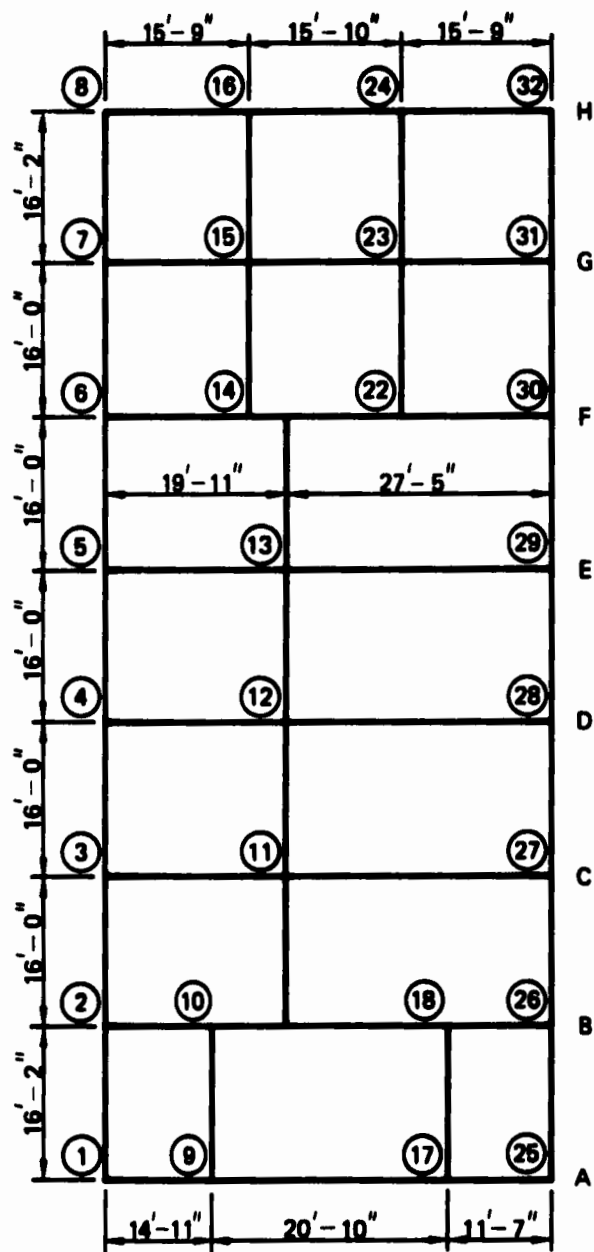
TYPICAL FRAMING PLAN (SIMPLIFIED)
